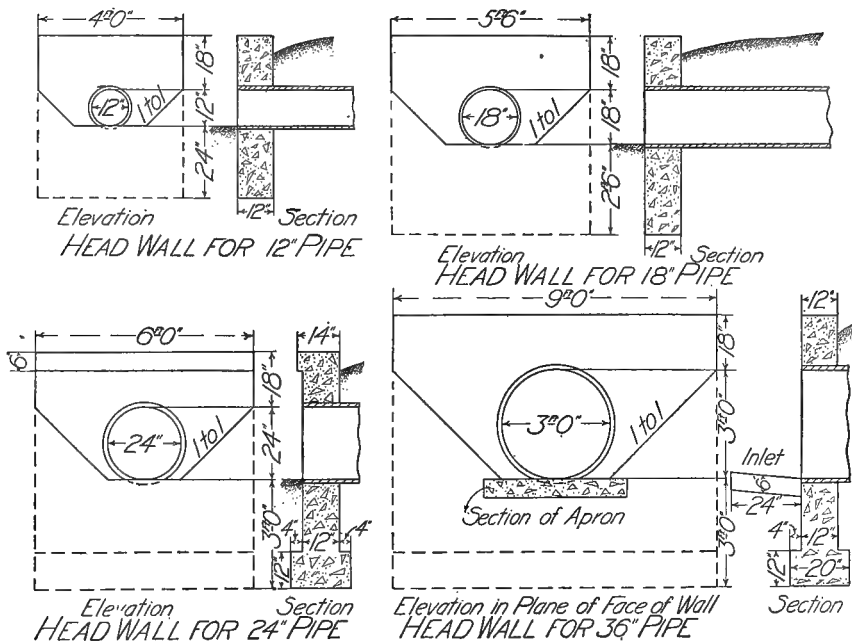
CONCRETE HEAD WALLS FOR METAL CULVERTS.
